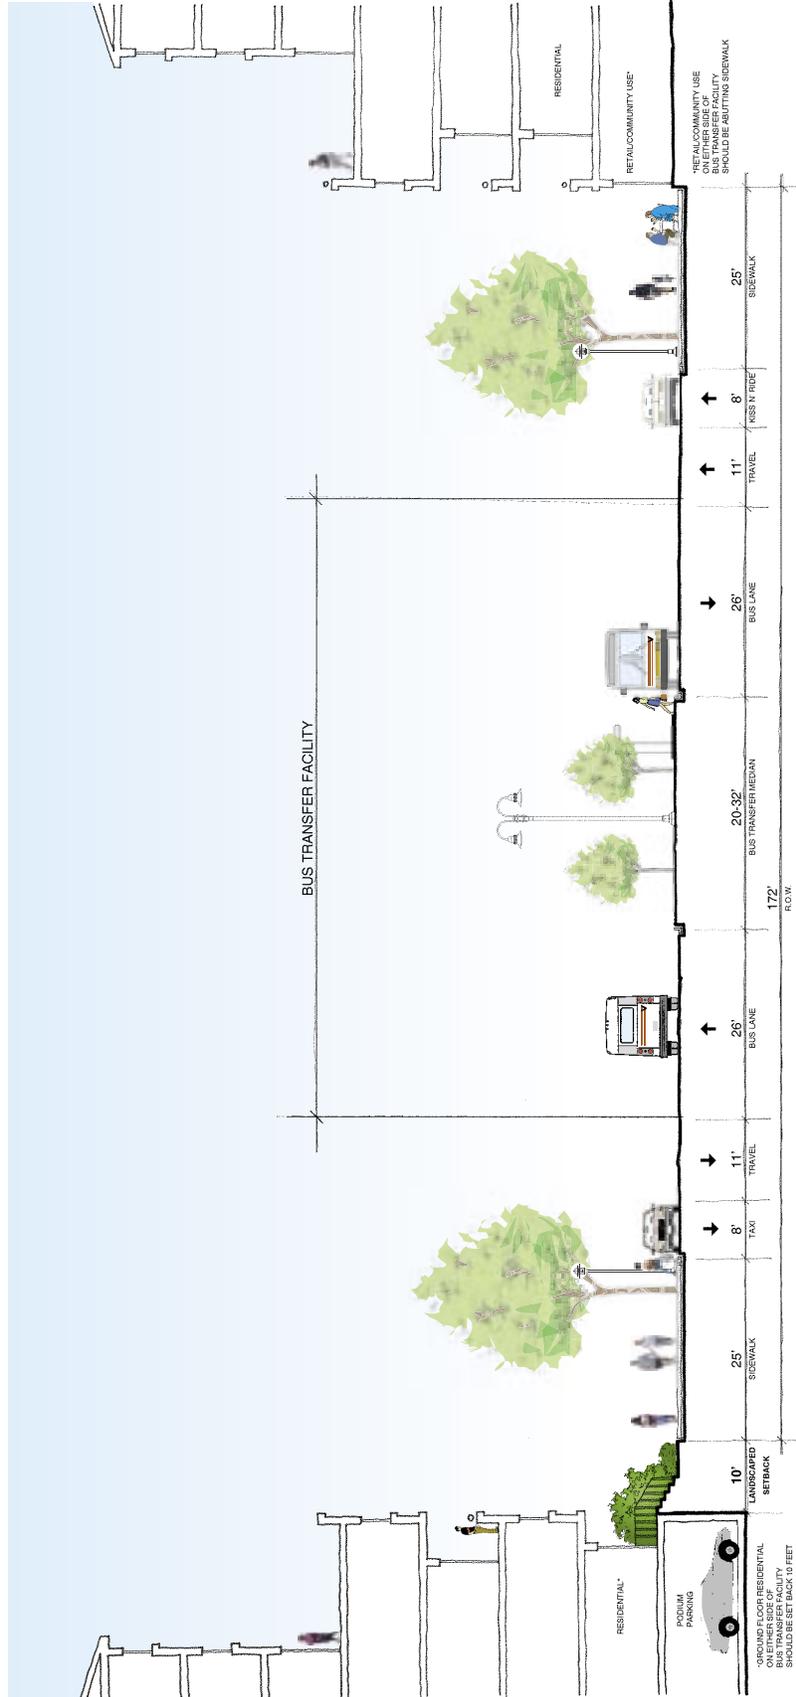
BART Station Transit Plaza Section looking west (illustrating “stepping down” of massing)
